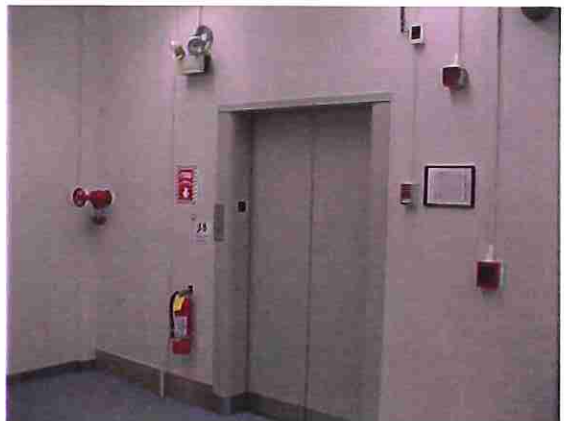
Fire pulls, horns, standpipe and fire extinguishers
